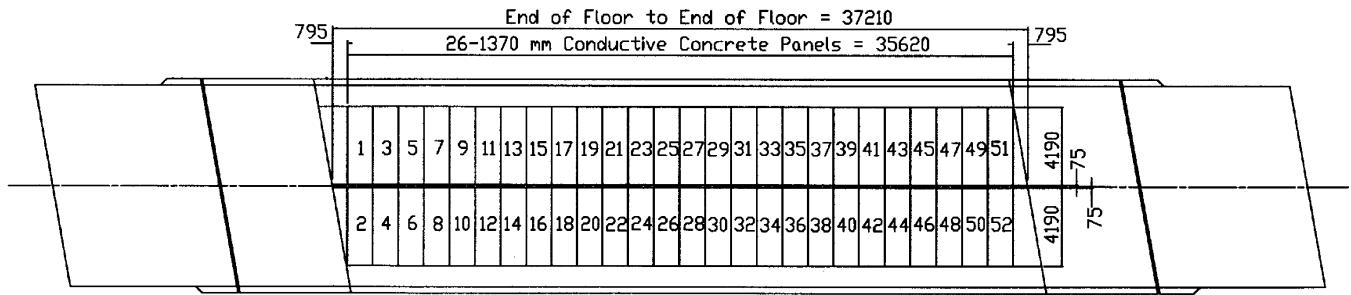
Conductive concrete panel layout (dimensions in mm).
